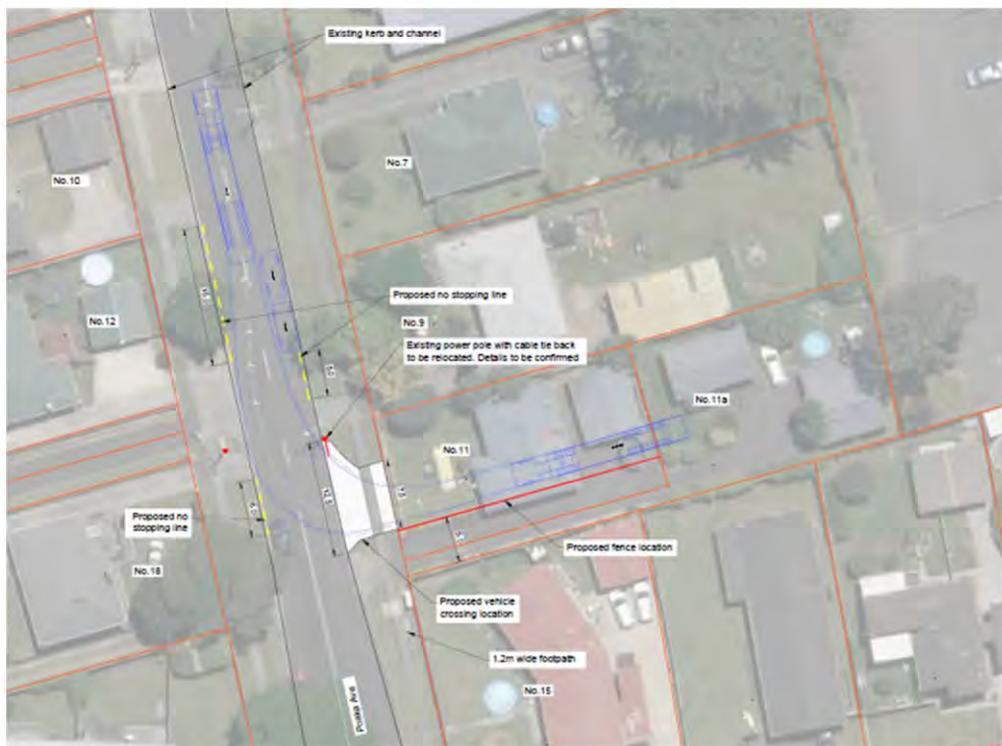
Site Plan(layout of the proposed access has since changed due to relocation of the noise fence. Only 8 staff parking spaces are provided)
